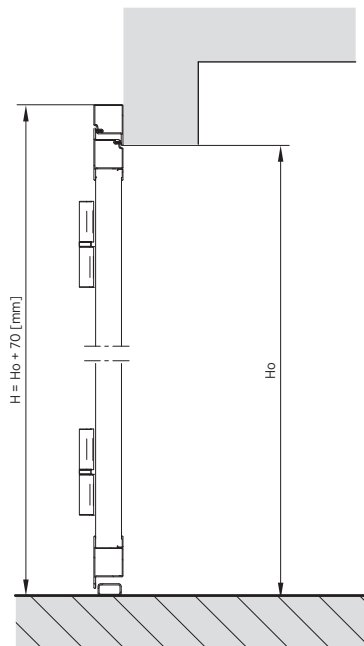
Installation in front of the opening – vertical cross-section – Presto 50 double-leaf door.
